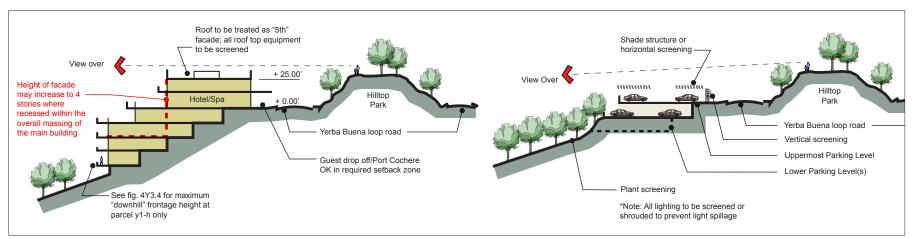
c: Section diagram at building (left) and parking structure (right)
